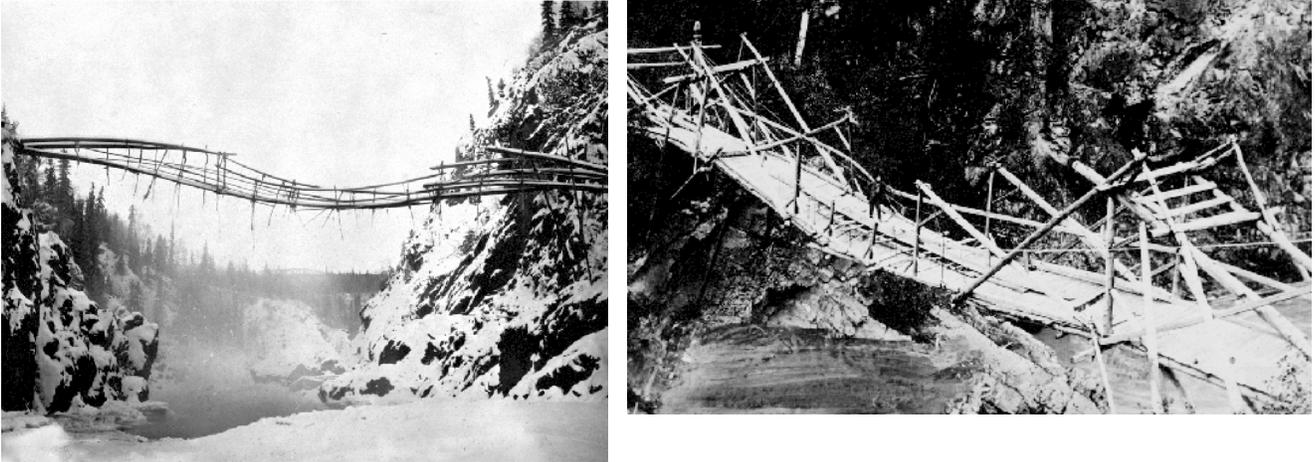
First and Second Hagwilget Bridge Over Bulkley Canyon (BC Archives Photo)
